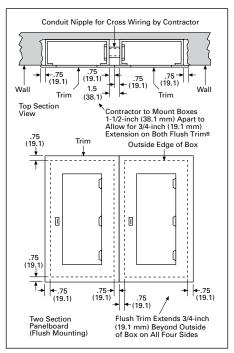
Multiple Section Panelboard-Flush Mounted—Dimensions in Inches (mm)
